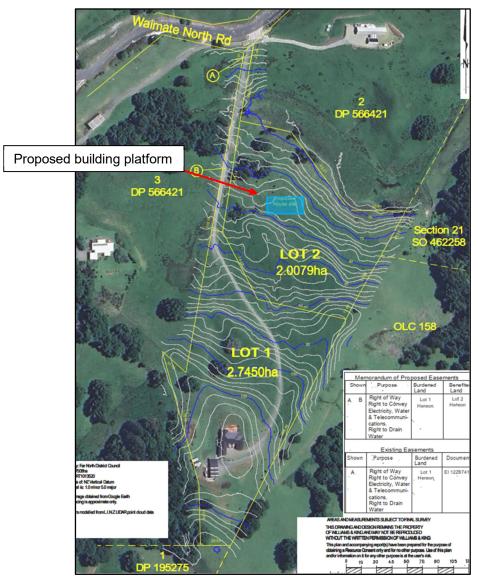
Proposed subdivision plan (Williams and King Ltd).
